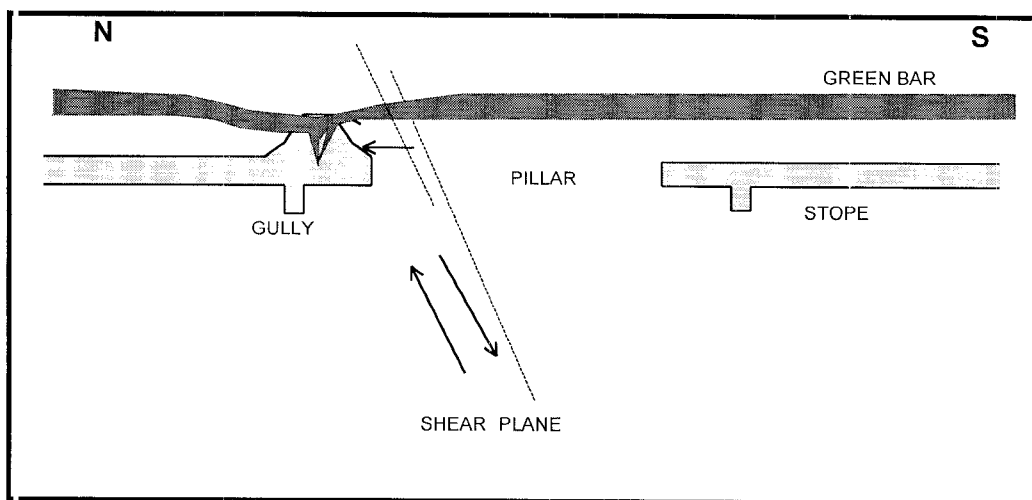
Section of a stope and stabilising pillar that failed. Horizontal dilation of the rock in the vicinity of the shear plane cause buckling and collapse of hangingwall above the gully.
